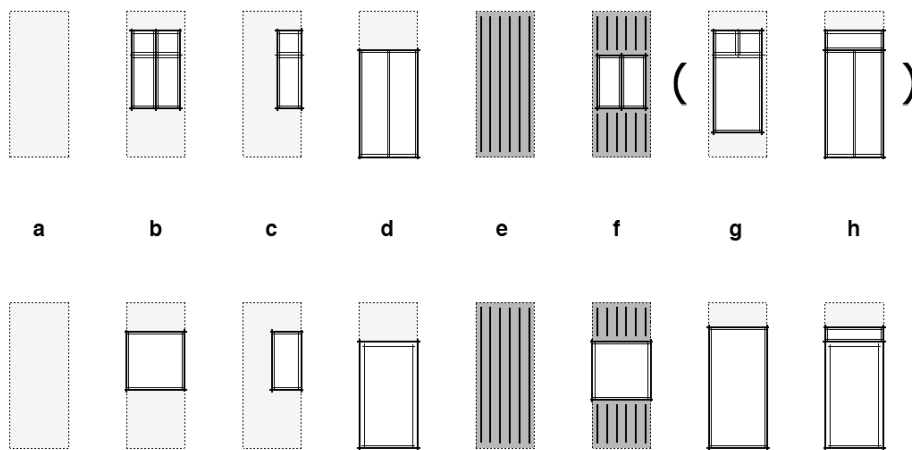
Facade elements of the classical facade (top) and the modern facade (bottom) shown in figure 10. From left to right: a) wall, b) window, c) half window, d) door, e) roof, f) roof window, g) shop window, h) shop door. Elements in brackets are not in use.
